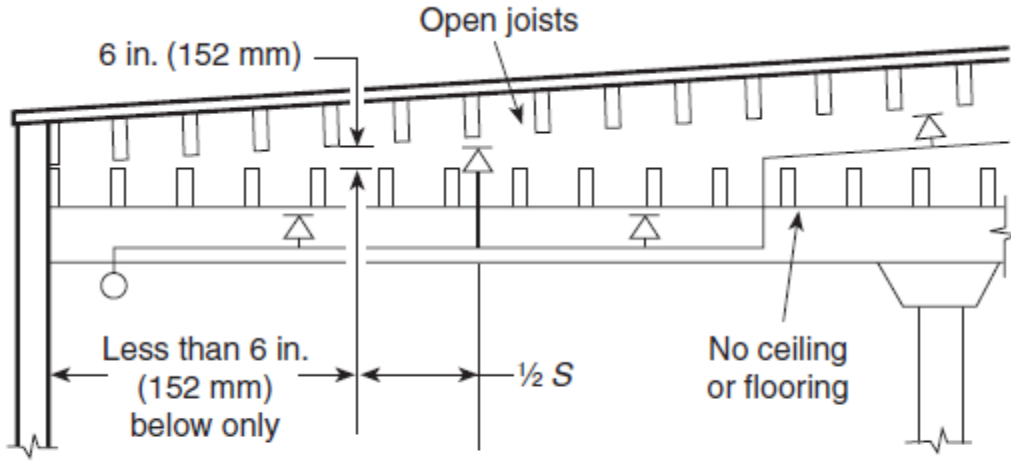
Arrangement of Sprinklers Under Two Sets of Open Joists — No Sheathing on Lower Joists.
